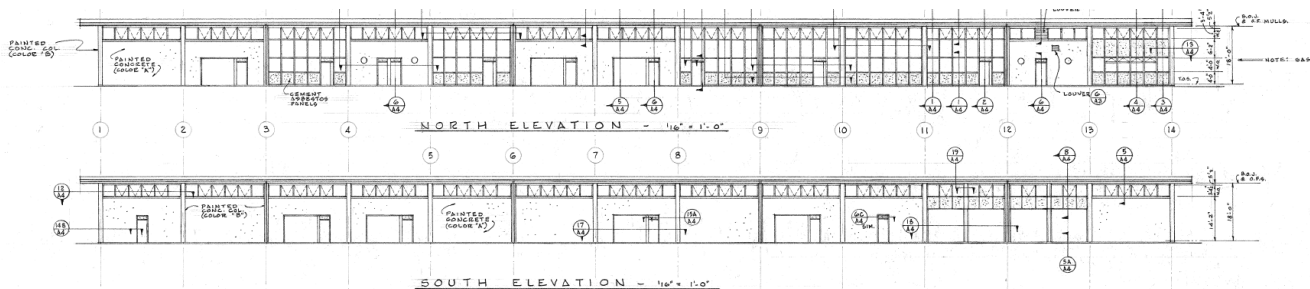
North and south elevations of 315 Bonair Siding Road, 1961. Prepared by CSPE. Source: Stanford University LBRE.
